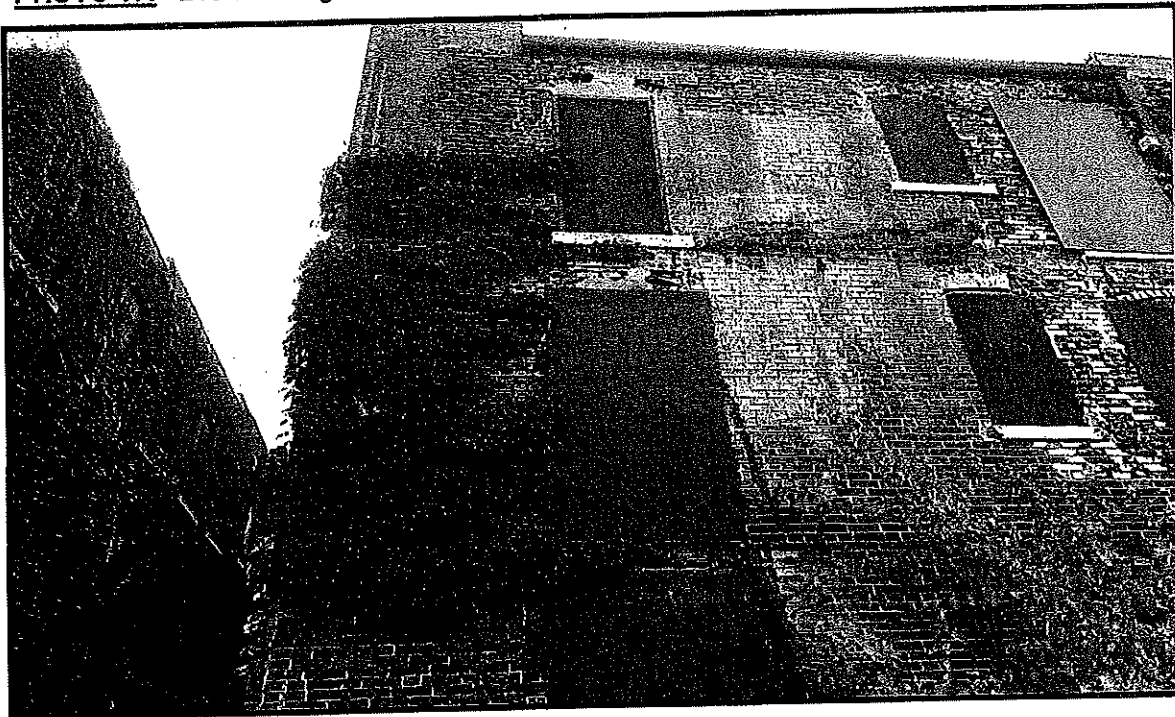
216 Washington Street East Elevation Deteriorated Mortar Joints.
